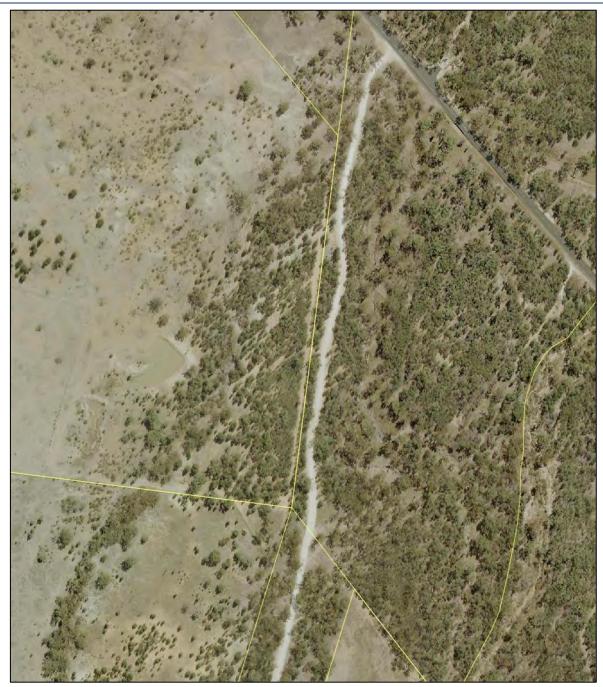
Substandard Horizontal Curves Between Access and Kogan Condamine Road (Aerial: QldGlobe)
